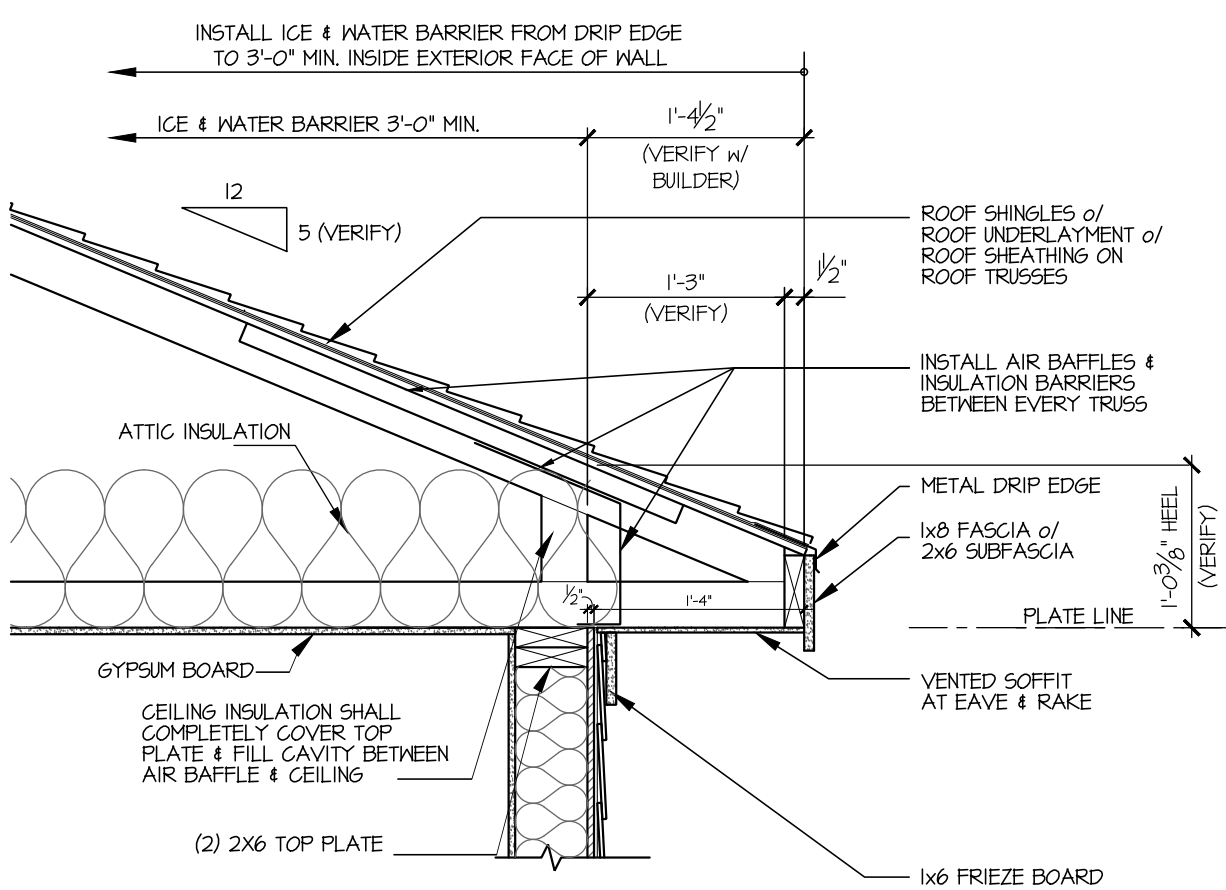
DETAIL SHOWN IS A TYPICAL DETAIL ONLY. EXTERIOR ELEVATIONS AND FLOOR PLANS SUPERSEDE DETAILS AND ANY DISCREPANCIES SHOULD BE VERIFIED PER BUILDER.
